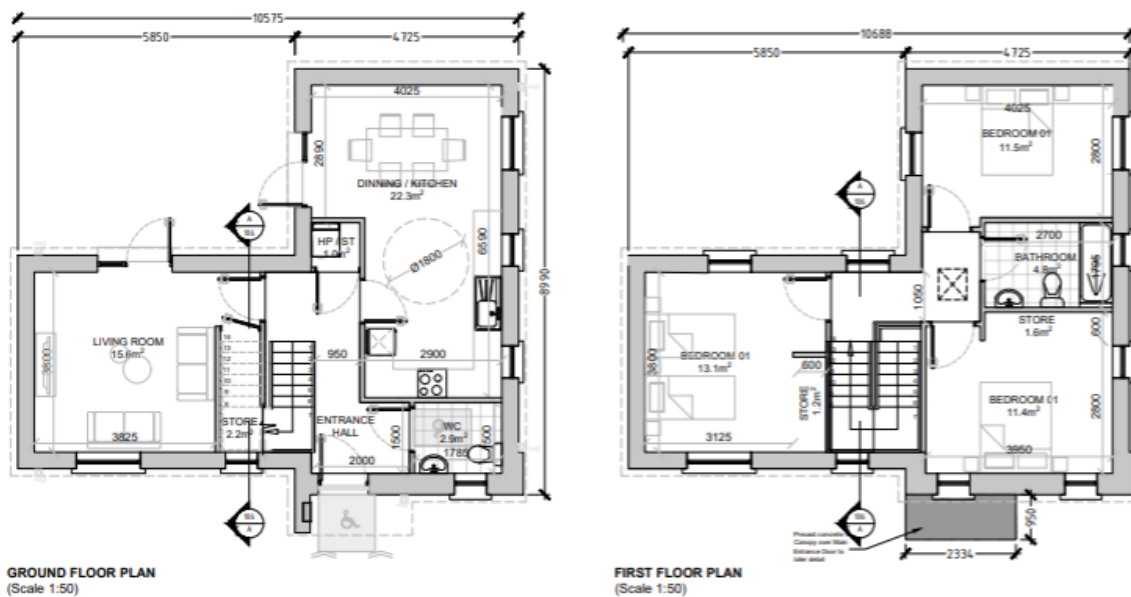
240026-DR-VHA-AR-105 House Type 4
